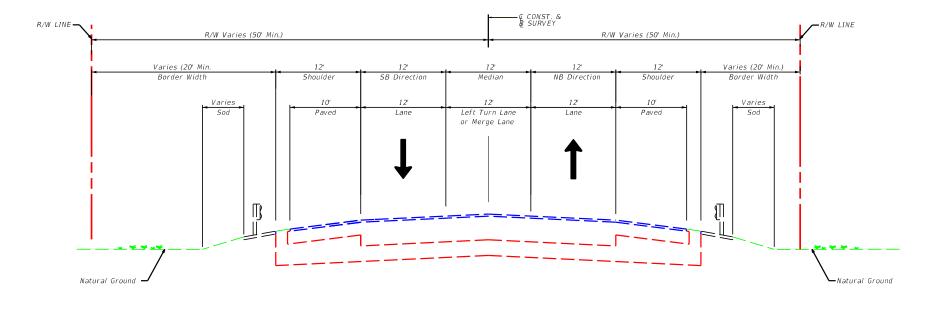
Existing Typical Section from E of Venetian Blvd to N of East Ridge Road
